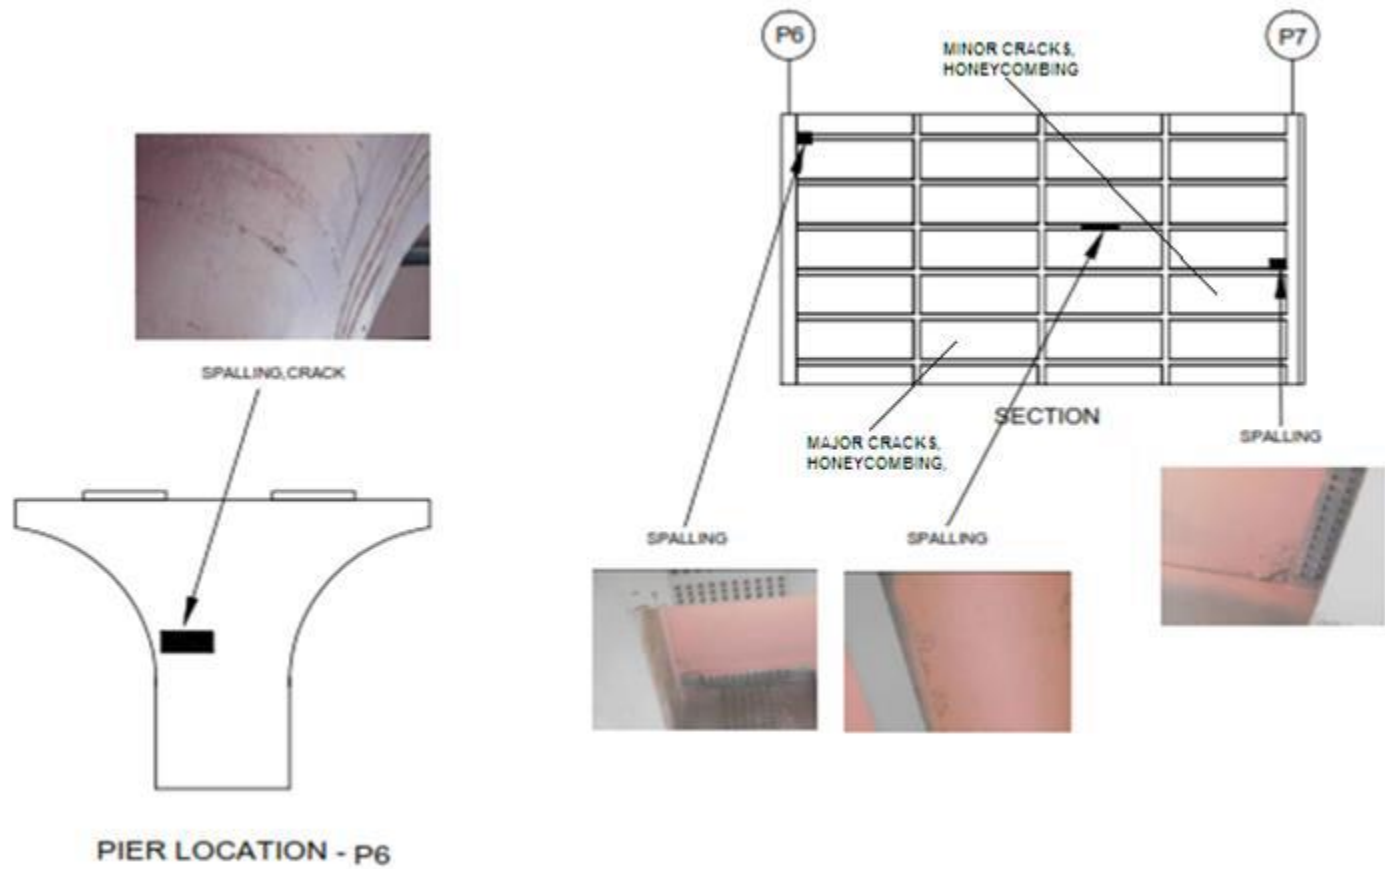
Spalling of concrete near the junction of girder and panels between P6-P7
